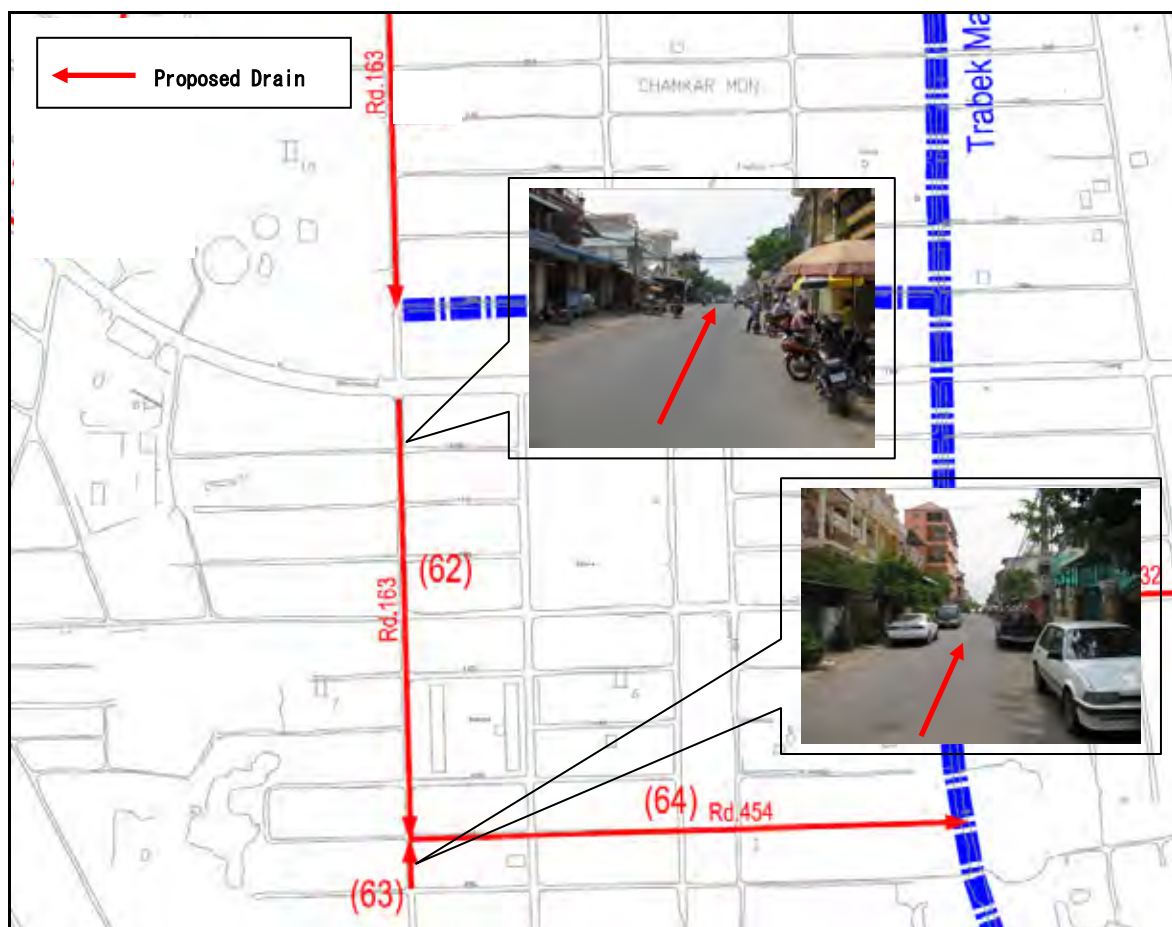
Alignment of Proposed Drainage Pipes (Tuol Tumpung North Area)
